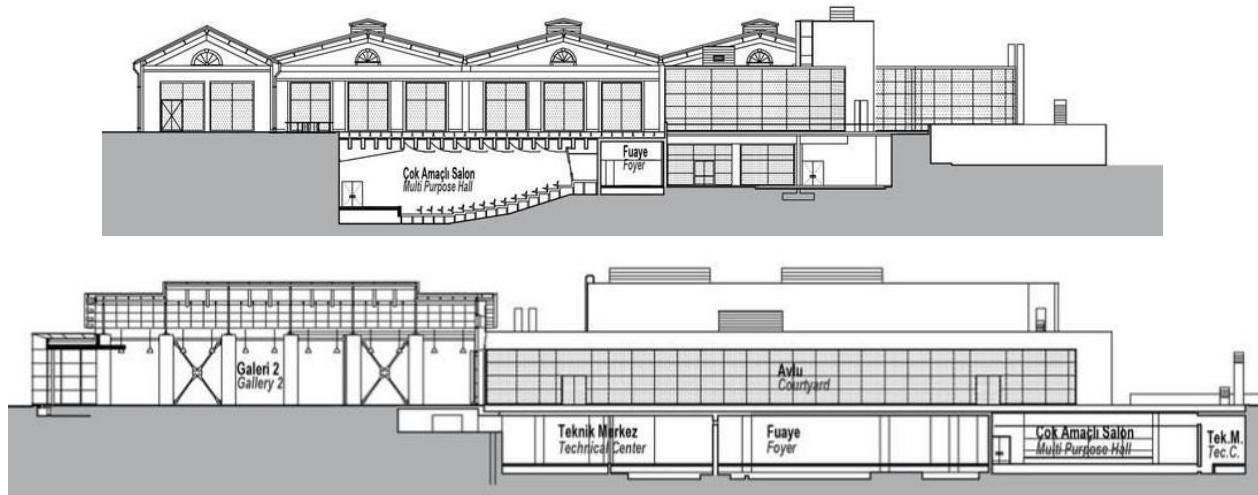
, 12. Plan and Section Drawings of CerModern (not to scale) (URL-1) [30]
